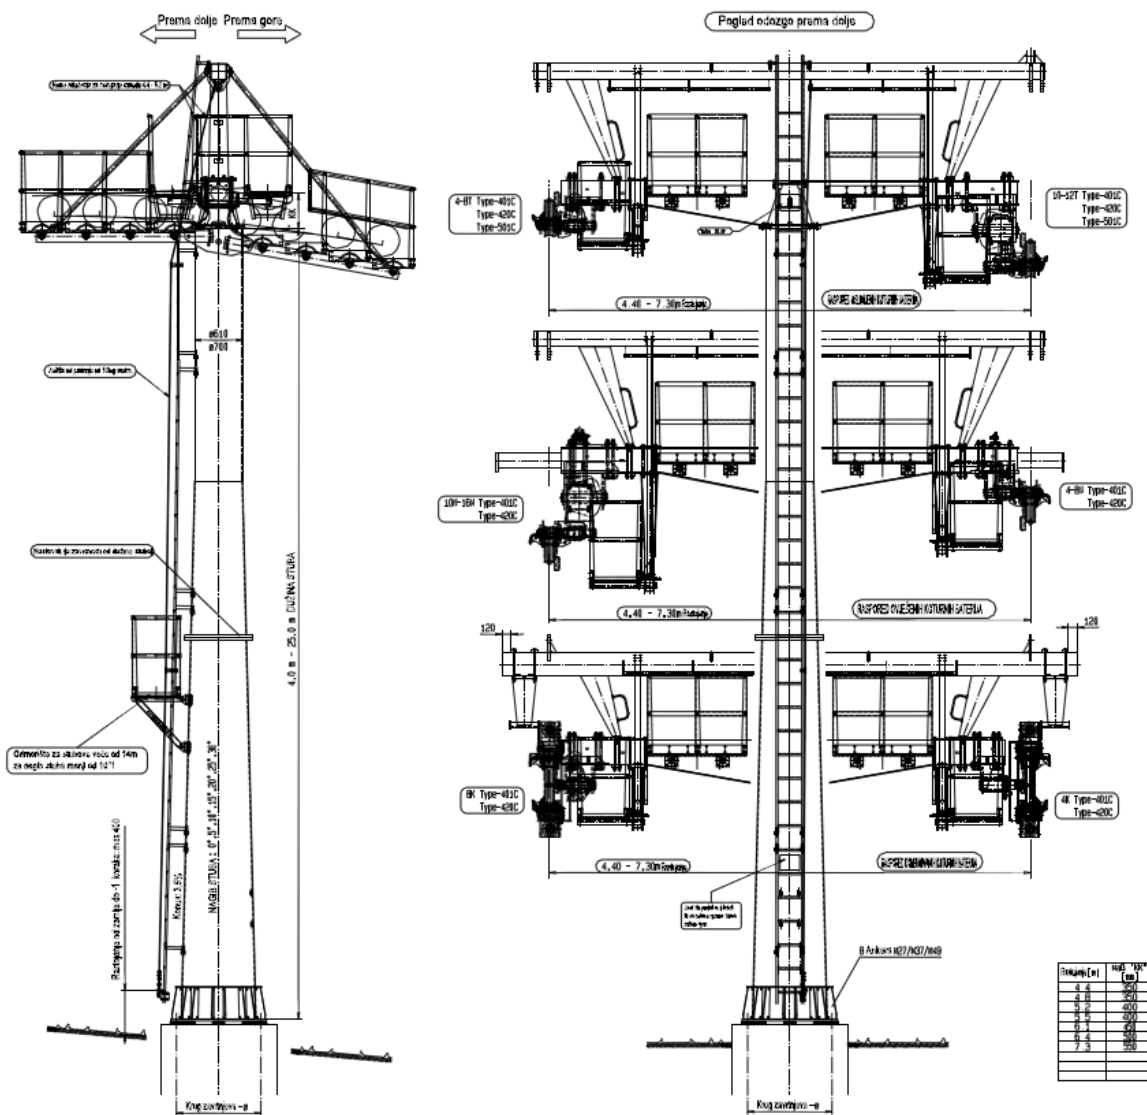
Typical tubular tower Ø610/Ø700 with 8 anchor bolts
